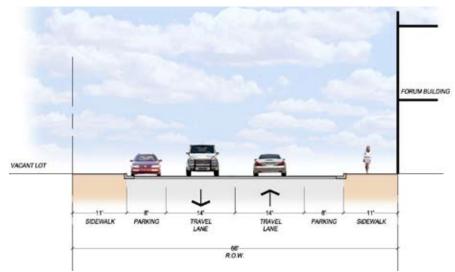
Existing Typical Section of 43rd Street between Prairie Avenue and Calumet Avenue
